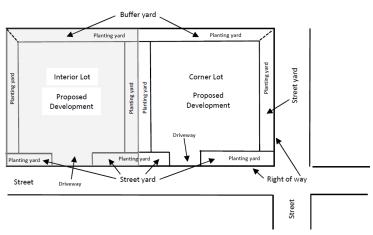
Planting Yard, Street Yard, and Buffer Yard Example
